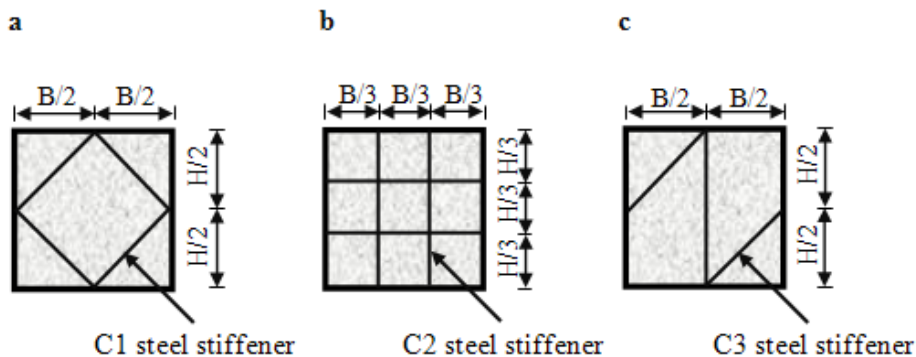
Arrangements of steel stiffeners in CFSC columns: (a) C1 steel stiffener, (b) C2 steel stiffener, (c) C3 steel stiffener
